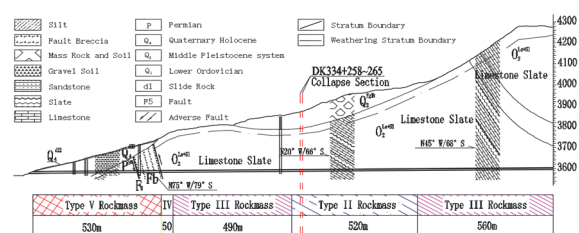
Longitudinal section of exit section of Daliang tunnel.
